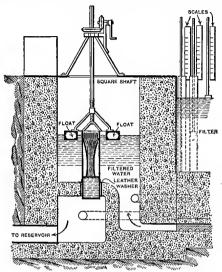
Regulator in Use in Zurich, Switzerland M. Peter, Engineer.
